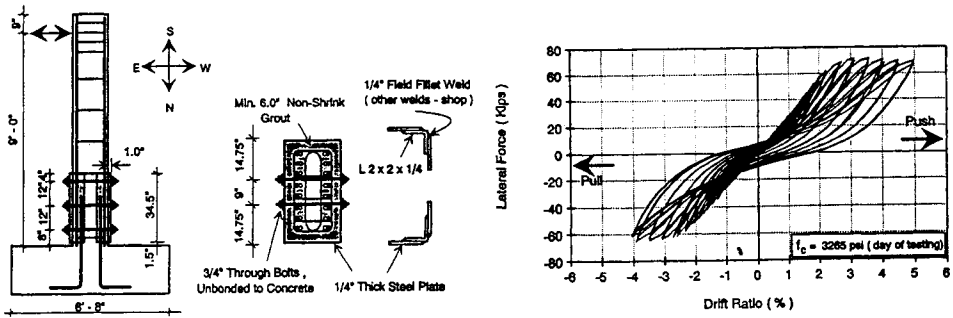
Column repaired by removing concrete around splices and adding steel jacket
